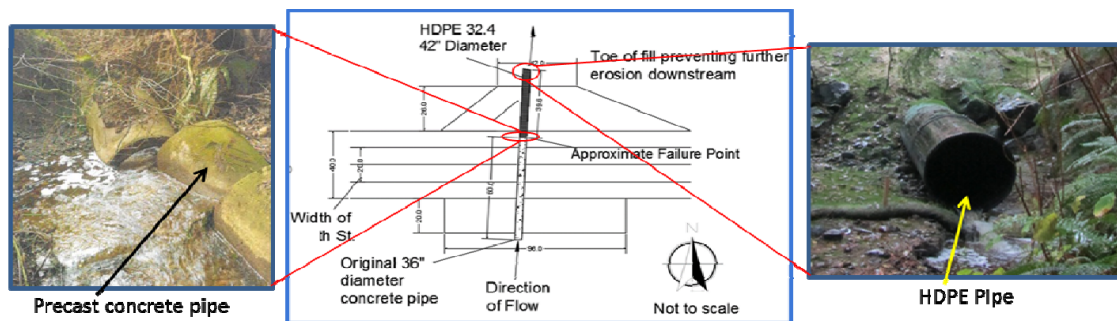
Plan view of Roadway and Culvert (center), Failed Precast Concrete Culvert (left) and View from Downstream of HDPE Retrofit (right)
